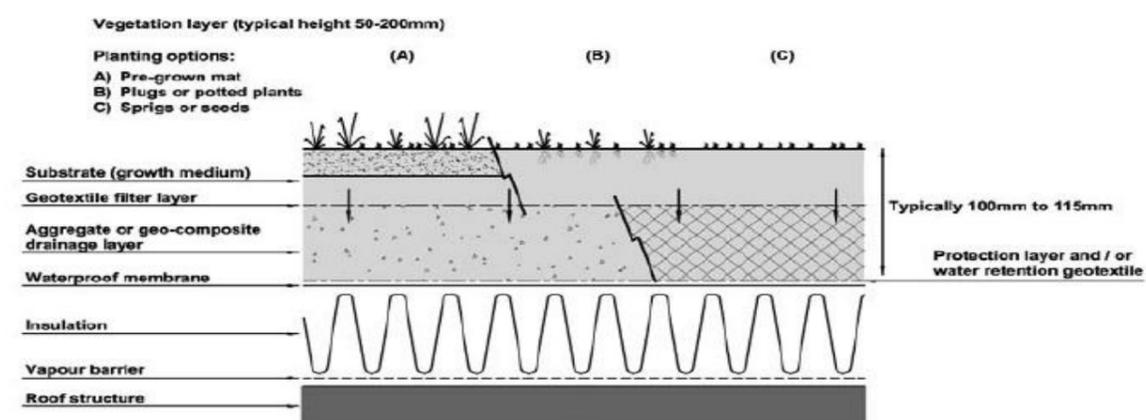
Green Roof Schematic (SuDS Manual, 2007)
